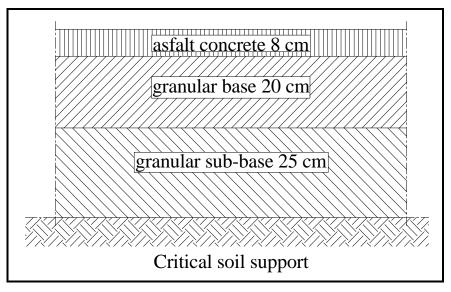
Road pavement structure on county road of DJ282B - Flamânzi, Botosani
